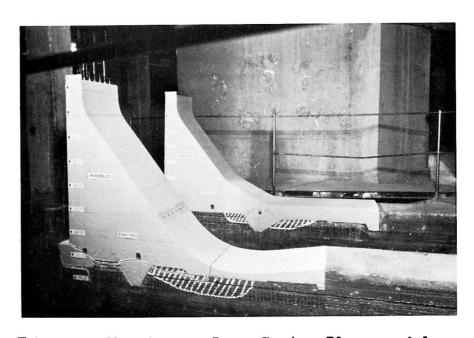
Mequinenza Dam, Spain. Plane model on geomechanical foundation.
